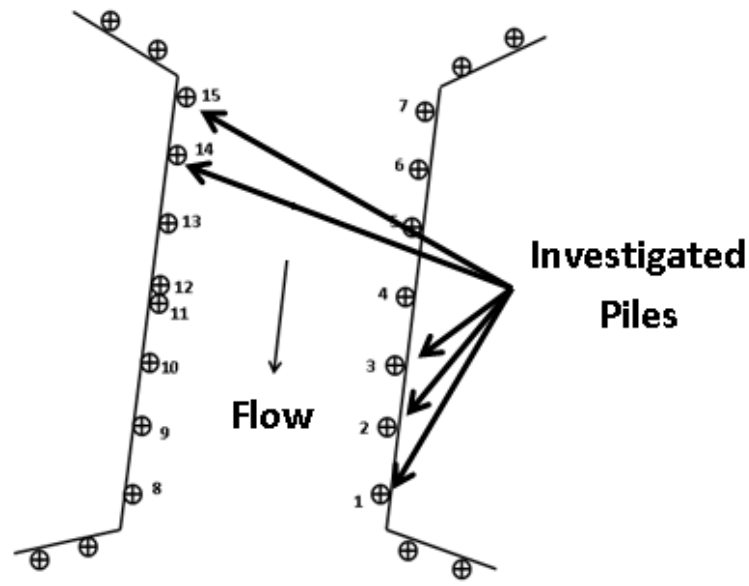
Foundation Plan and the Investigated Piles of Bridge No. 6922
